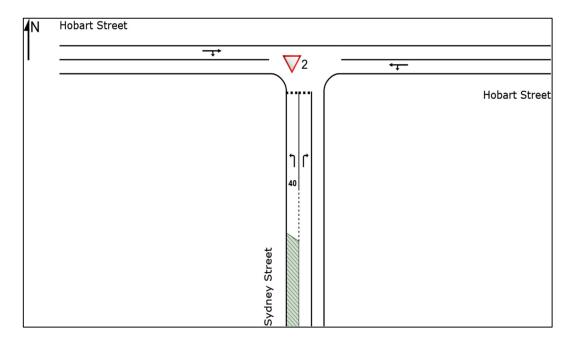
Priority Intersection Layout of Hobart Street with Sydney Street (SIDRA
